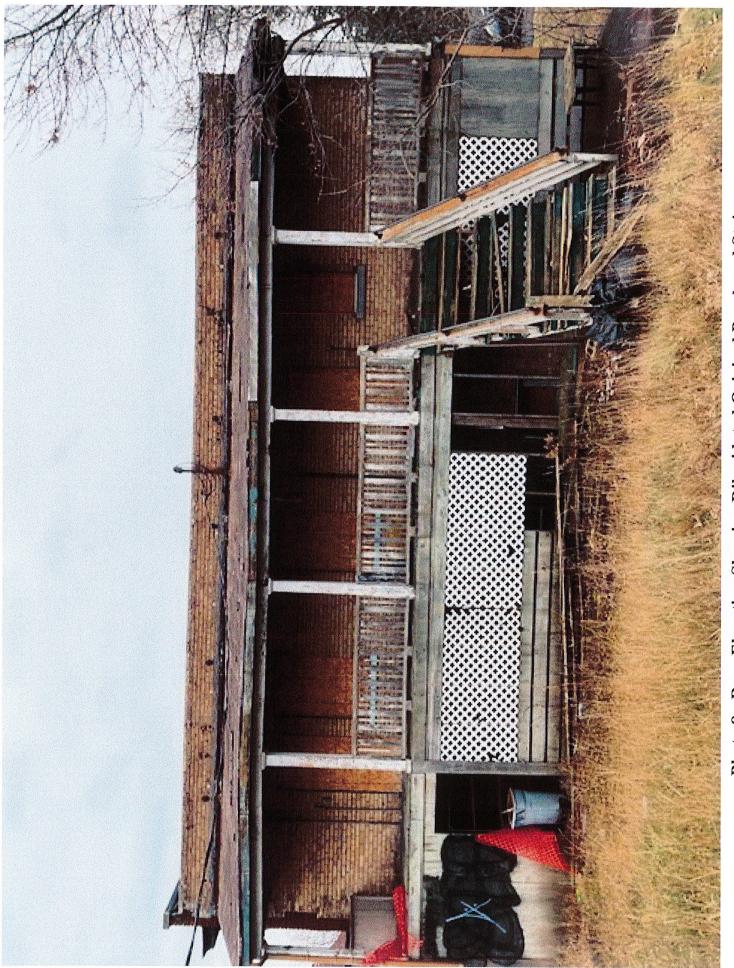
Rear Elevation Showing Dilapidated Original Porch and Stairs
